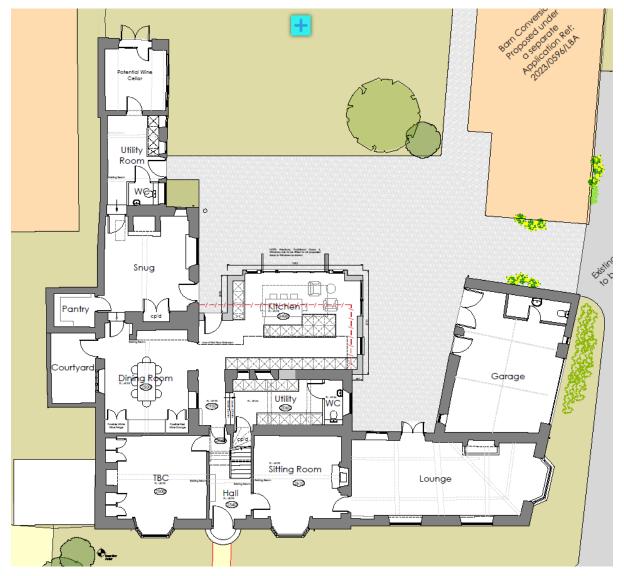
Proposed ground floor plan (the outline of the existing conservatory is shown dashed in red)
